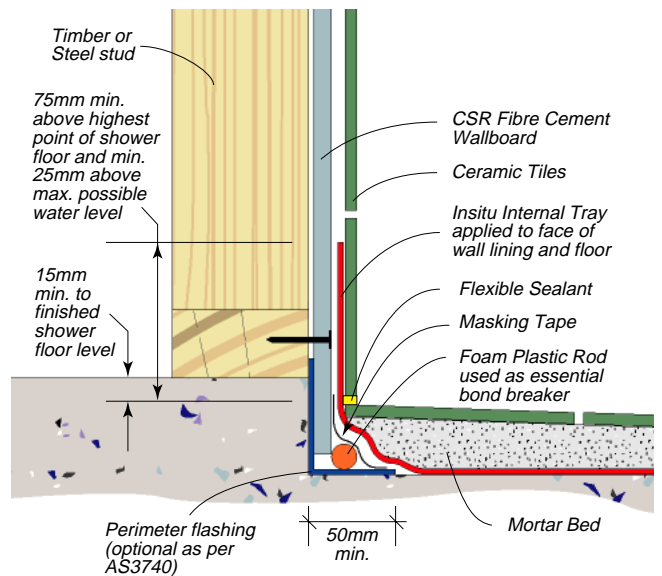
TYPICAL DETAIL FOR INSITU INTERNAL TRAY SHOWER RECESS .
